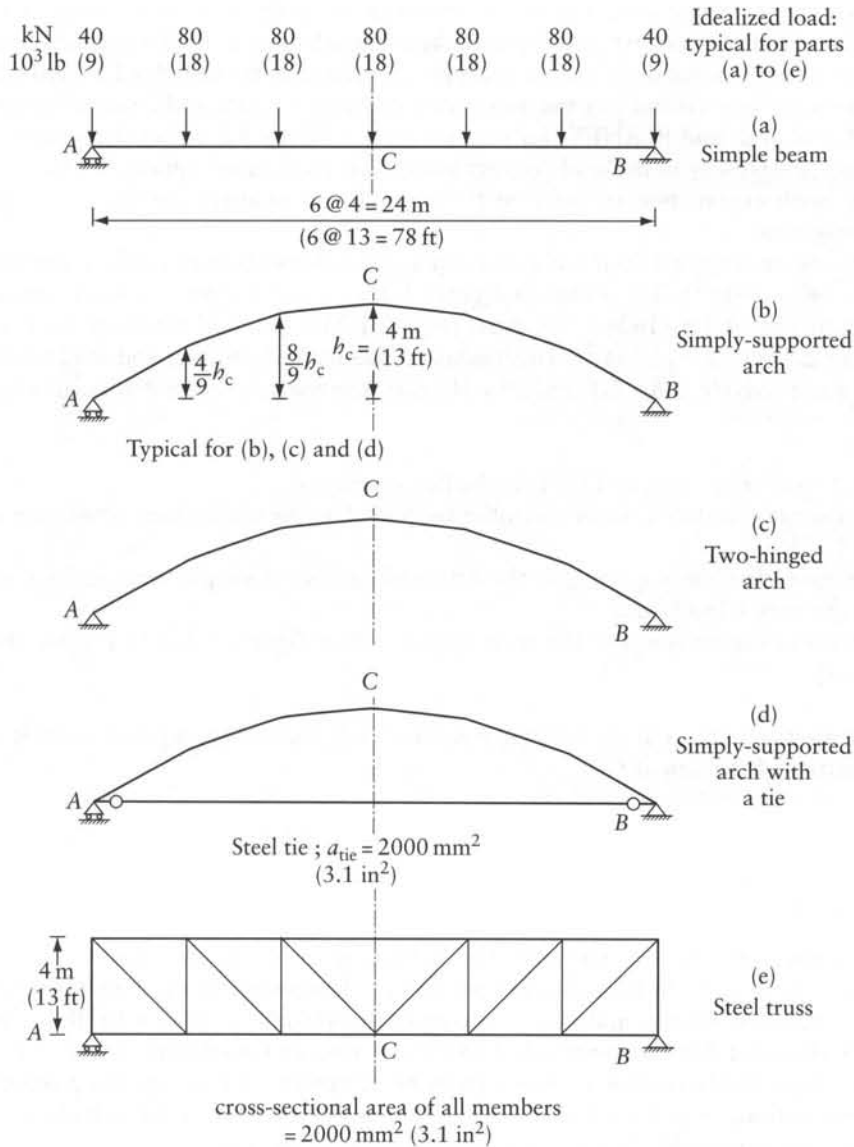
Structures covering same span and carrying same load (Example 1.1). (a) Simple beam. (b) Simply-supported arch. (c) Two-hinged arch. (d) Simply-supported arch with a tie. (e) Truss.
